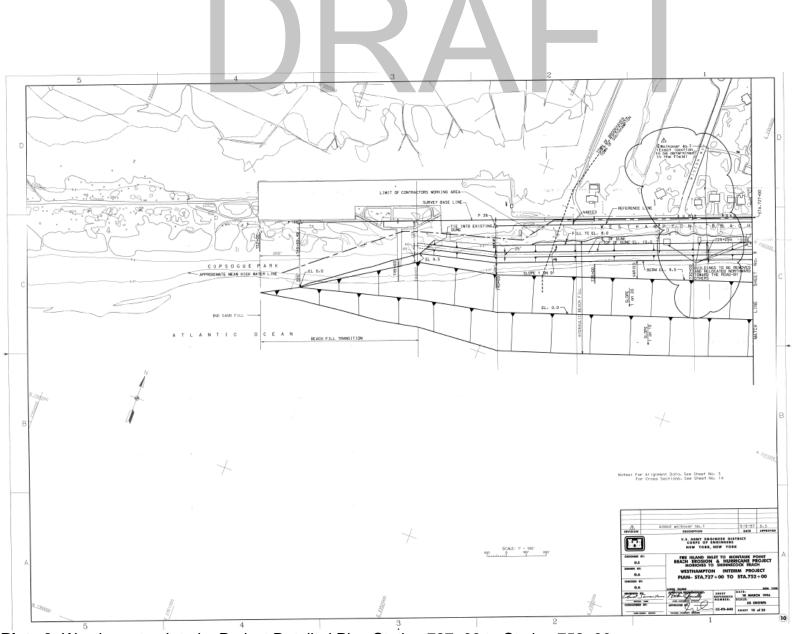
Westhampton Interim Project Detailed Plan Station 727+00 to Station 752+00
